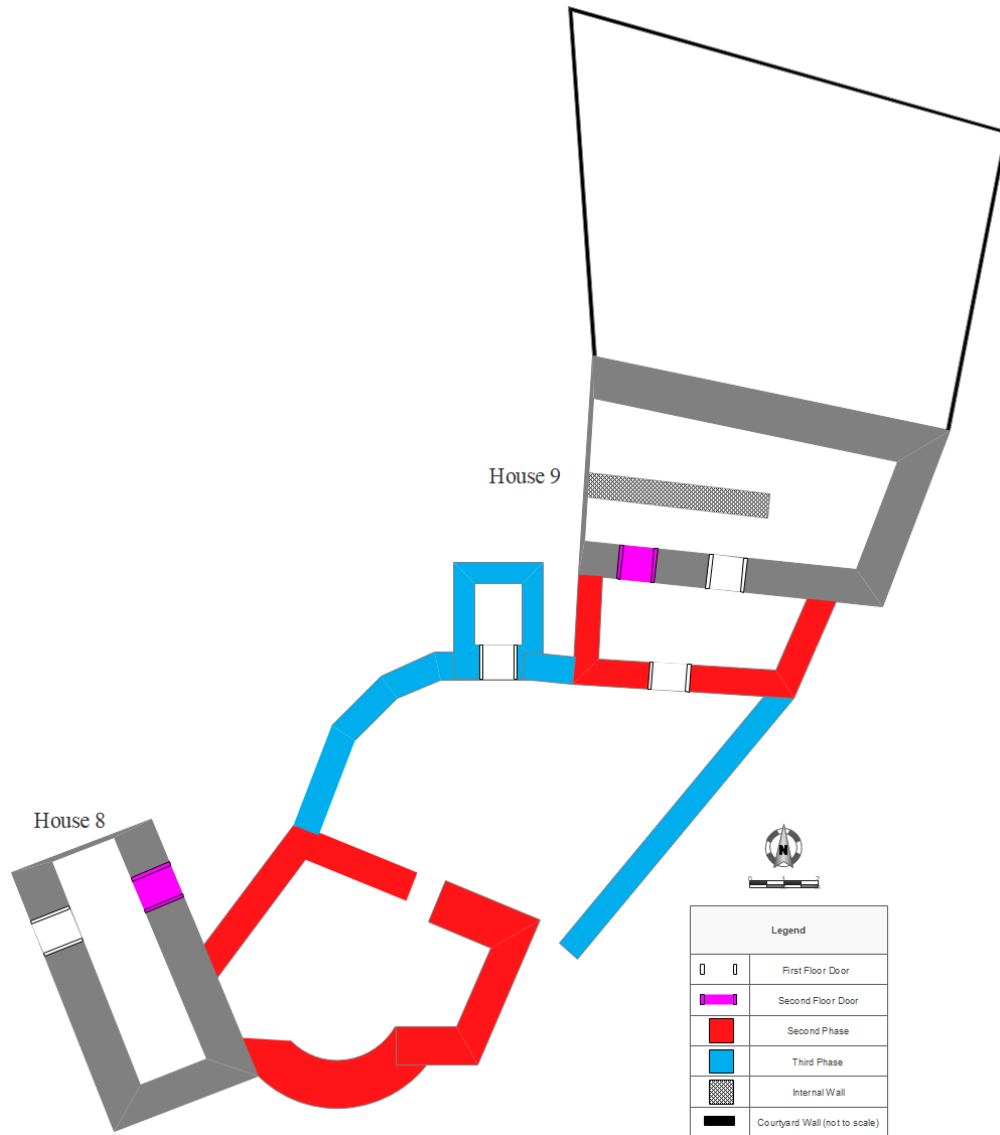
Ground plan of House 8 and 9, Sarania. (M. Pawlowski)
